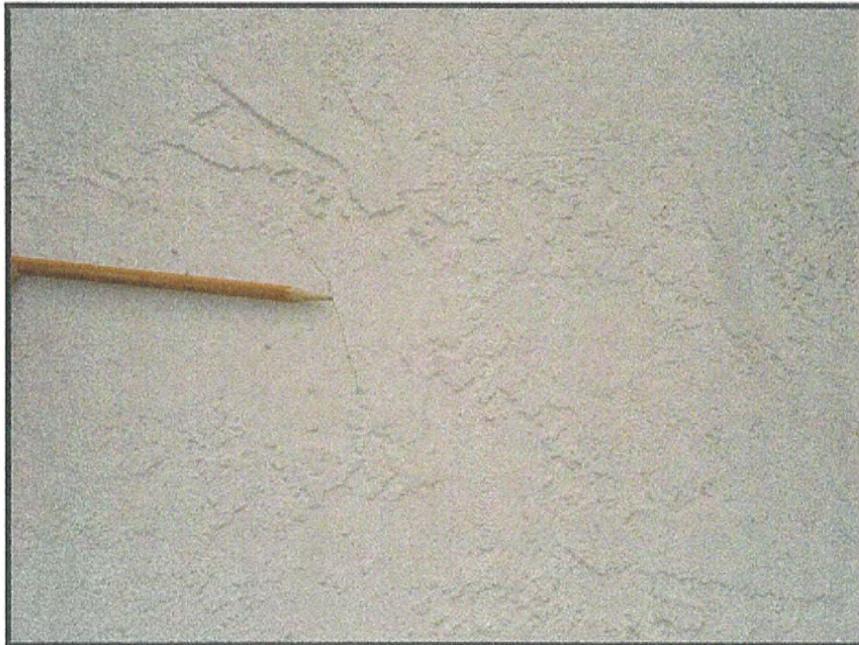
Step cracking along East wall at Southeast corner of building.
